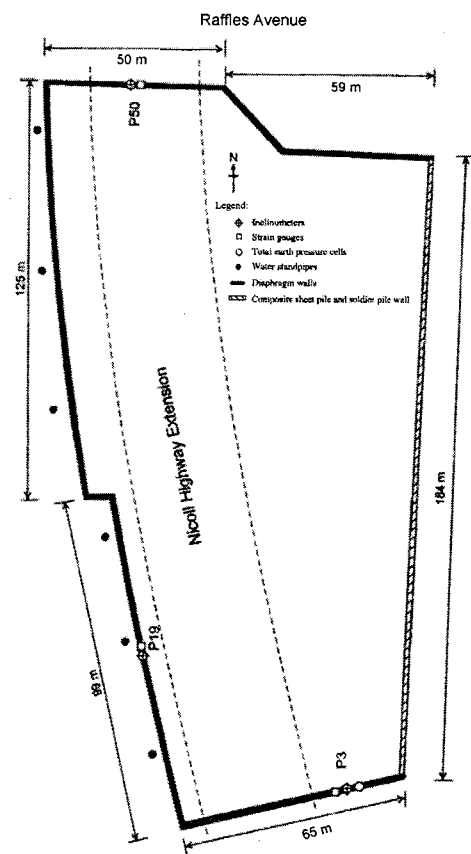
Plan layout of basement excavation for the Esplanade Car Park
